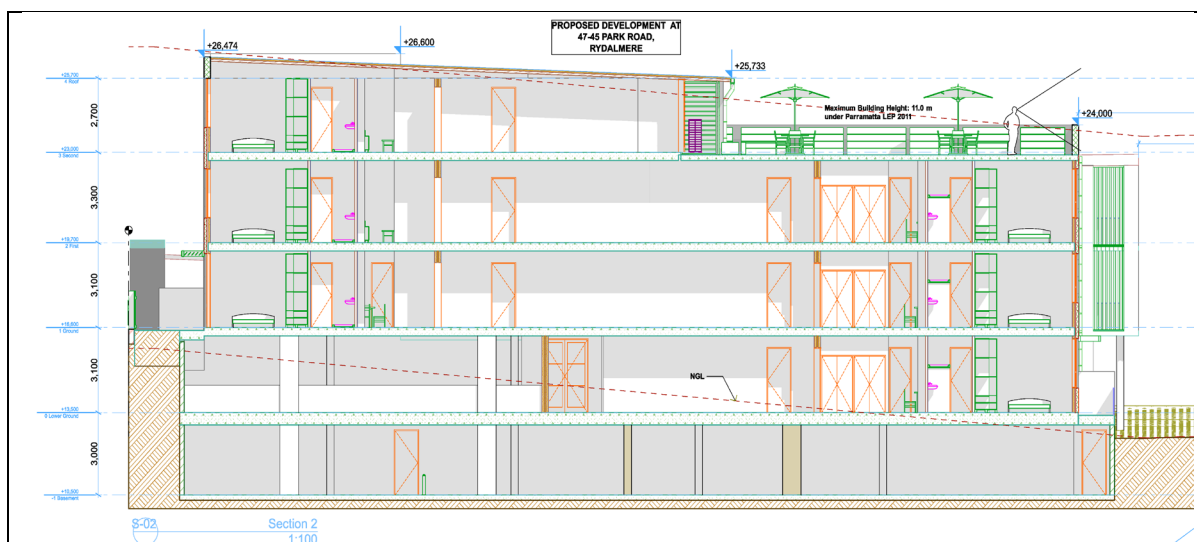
Cross section of the proposed building, showing extent of the non-compliance
